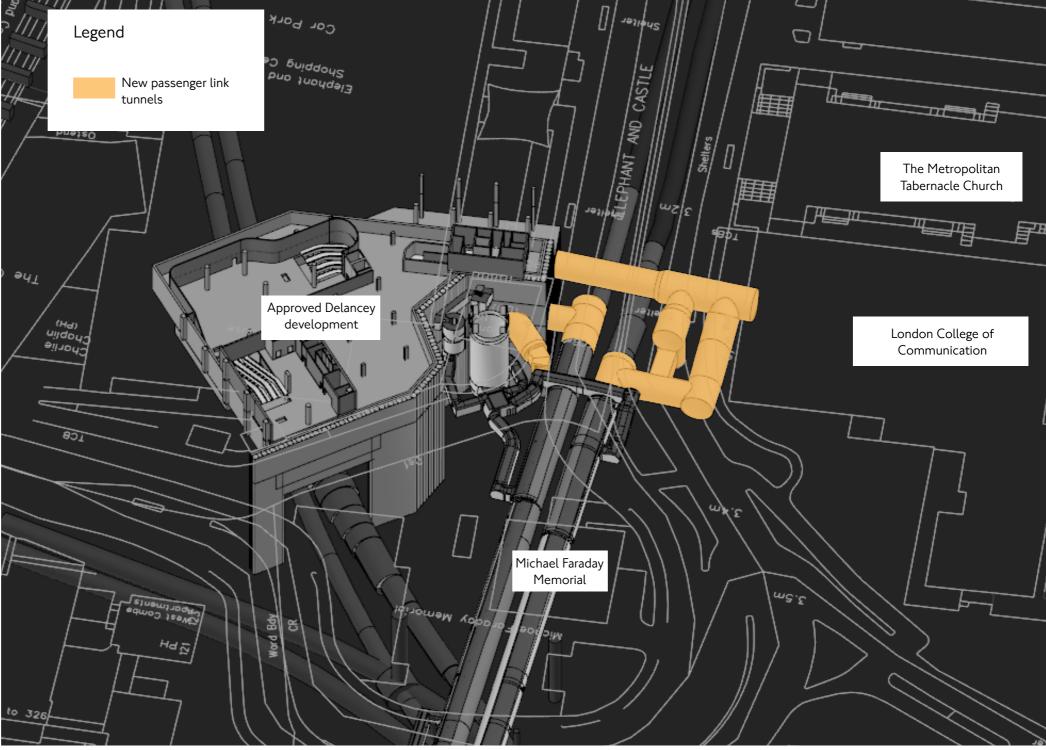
New Northern Line passenger link tunnels in relation with the road network above and adjacent buildings - indicative only
